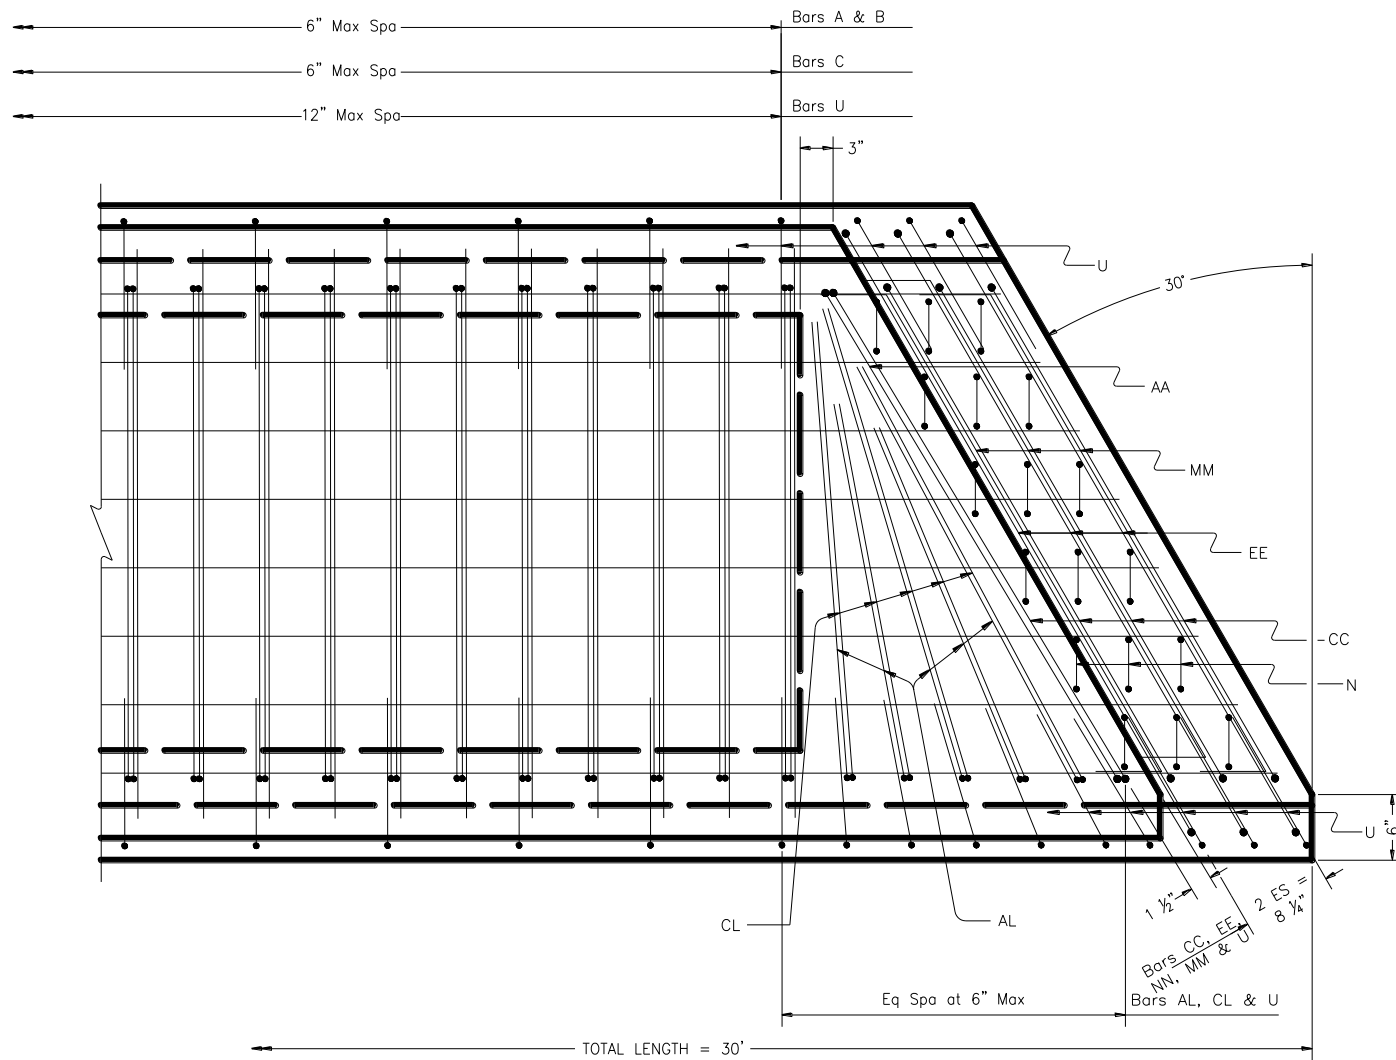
Partial Plan – Skewed End. Beam 5B40-1
